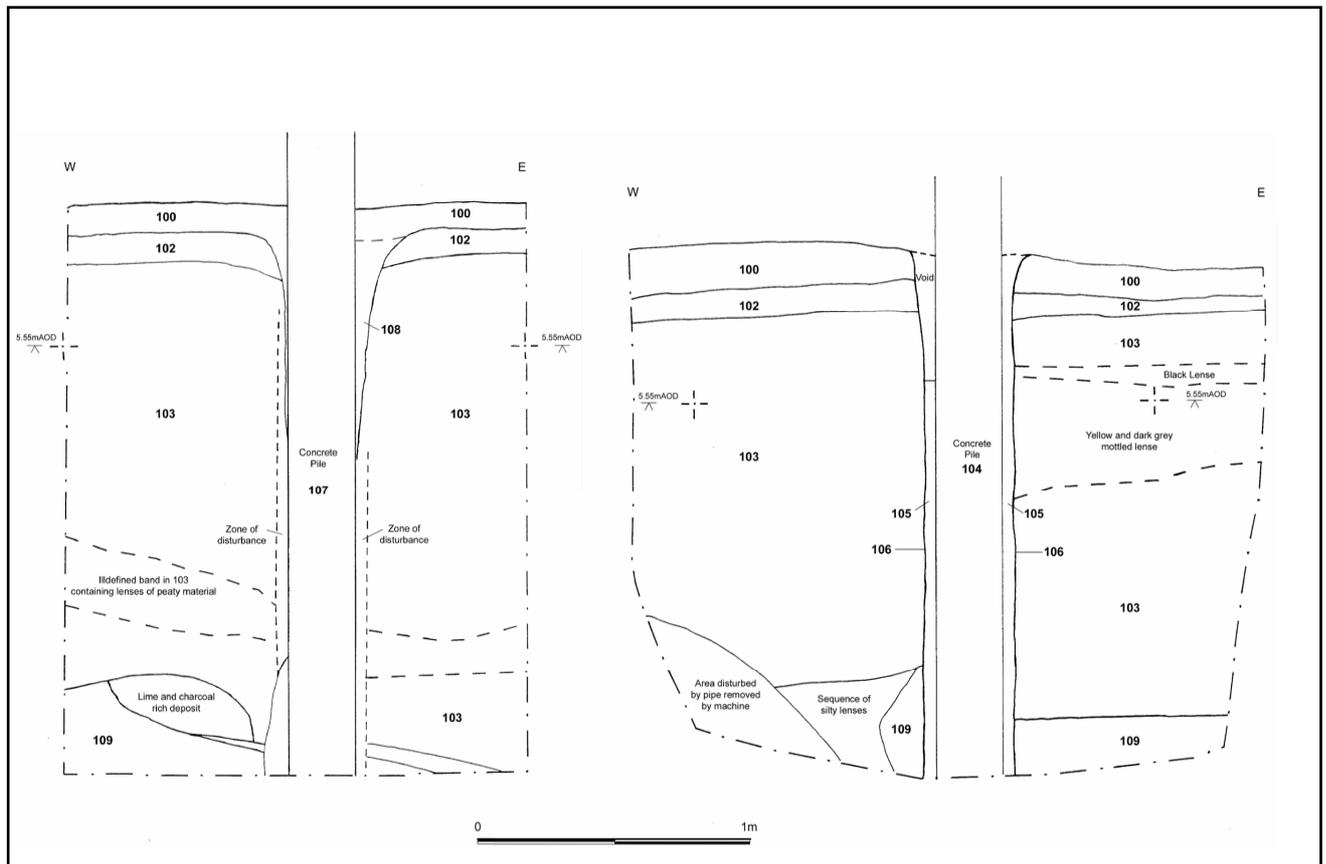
Pile sleeve through a thin beaten earth floor, No.1 Poultry, London (copyright Museum of London Archaeology Service)
